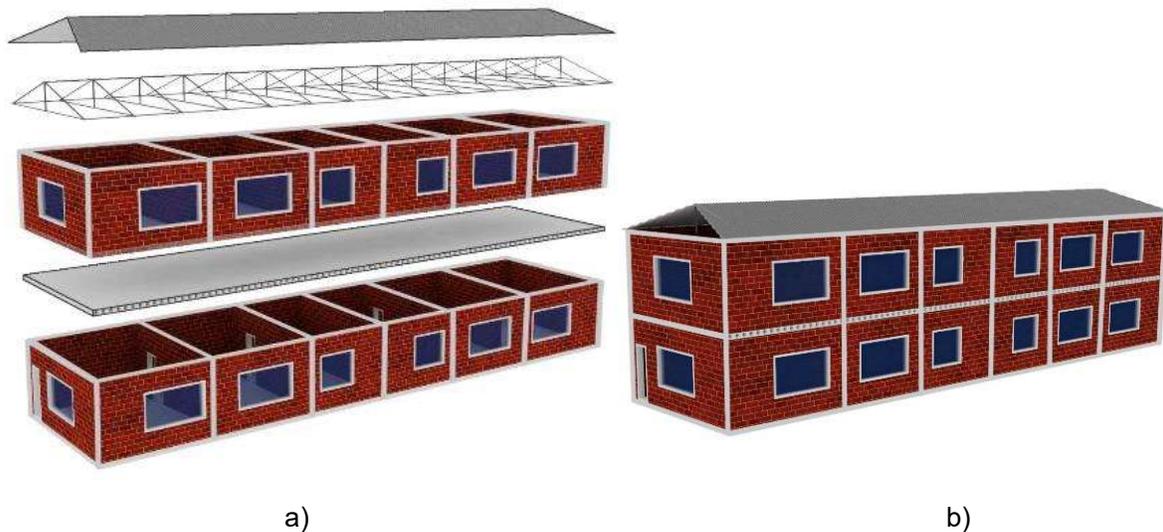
Confined masonry building with precast RC floors (EMCA 13): a) key elements, and b) an isometric view of the building.
